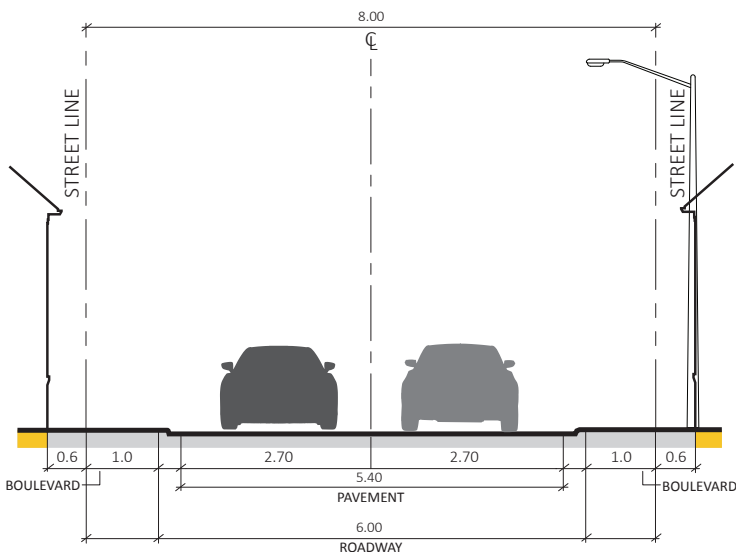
Laneway (8m R.O.W.) Cross-Section
